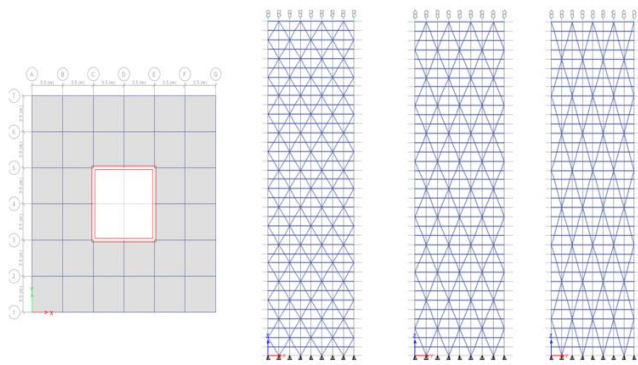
Plan & Elevation of 30 Storey Diagrid Structural System with 4Storey, 6Storey & 8Storey Module variation
